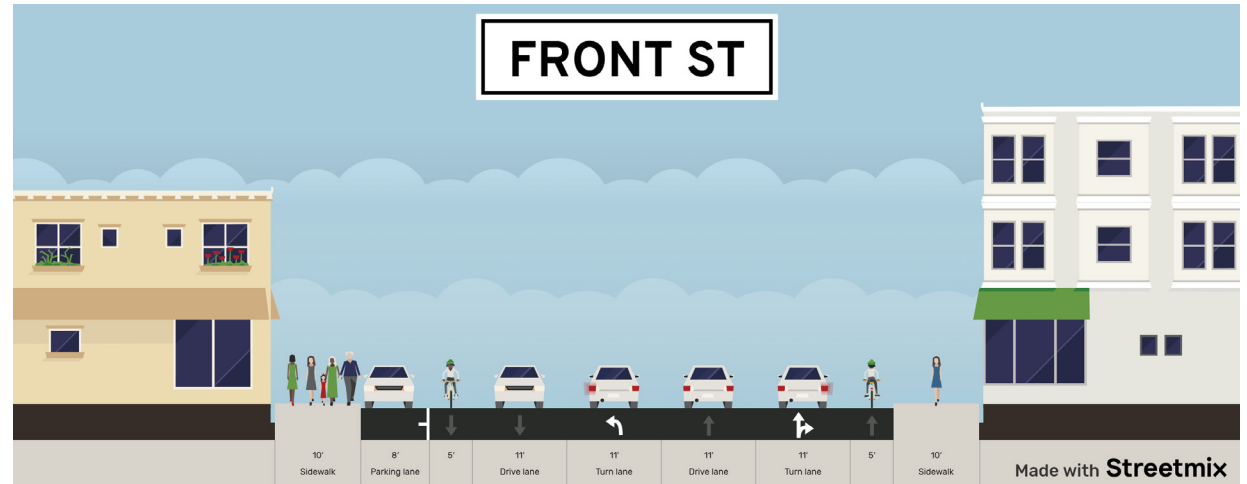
Existing Front Street Layout (facing north from Liberty Street)
